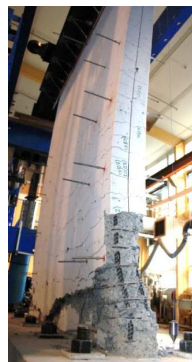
Out-of-plane instability and concrete crushing of a wall test reported by Dashti et. (2018).
